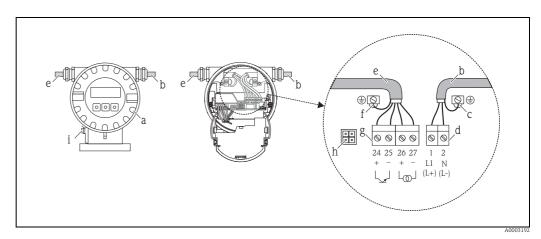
Connecting the transmitter (aluminum field housing). Cable cross-section: max. 2.5 mm²
